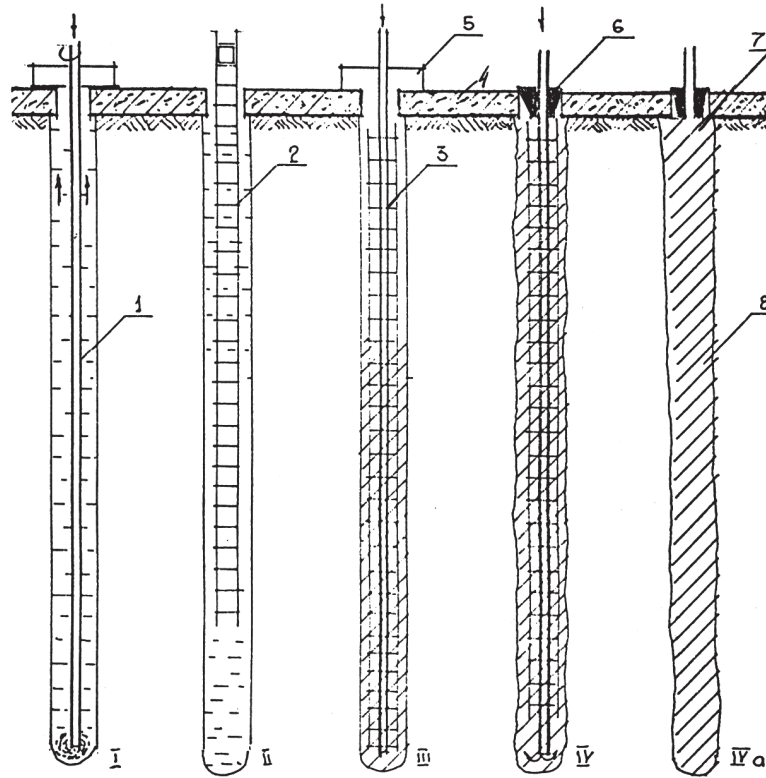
Technological scheme for arrangement of root piles with wells washing by concrete mortar: I – boring with chisel drilling bits; II – installing reinforcement cages; III – installation of injection pipe and filling the hole with a mortar; IV – tampons and establishing pressing of wells; IVa – pressing of wells at the mouth of the pile. 1 – drilling pipe; 2 – reinforcing cage; 3 – injection pipe; 4 – reinforced foundation; 5 – mouth tray; 6 – swab with gland; 7 – extended part of the pile; 8 – finished pile
